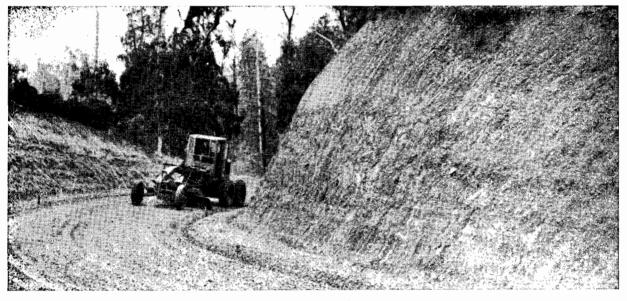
A grader working on the Reefton Spur end of the new Yarra Track.
